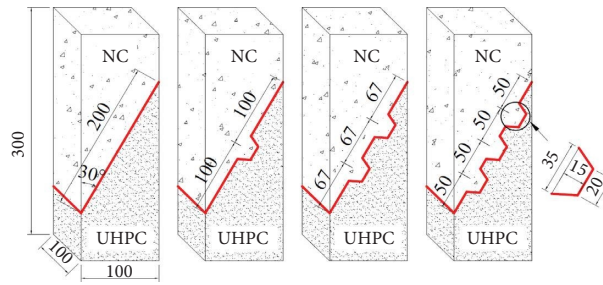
Dimensions of the specimen and trapezoidal keyway of UHPC-NC (unit: mm).
